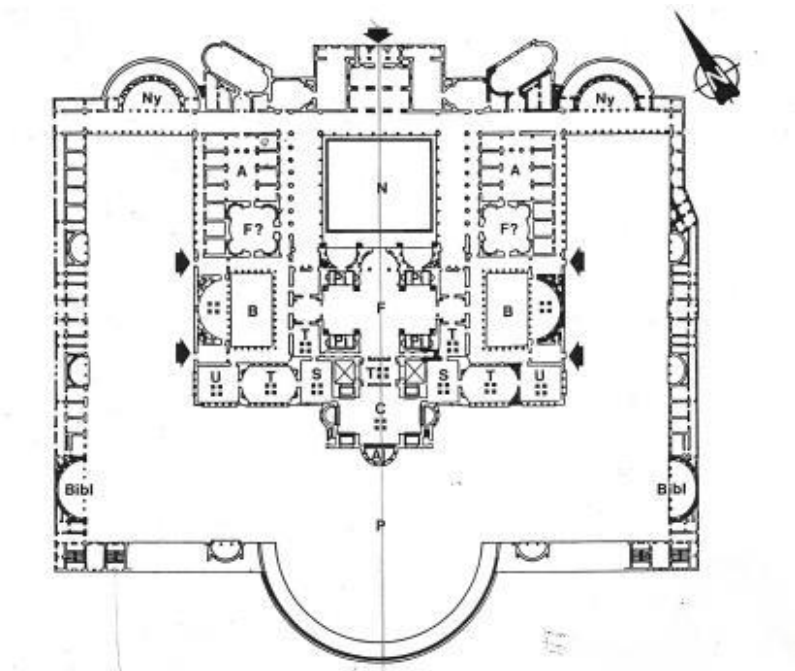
Floor plan of Trajan's thermae (Guan, 2017).
